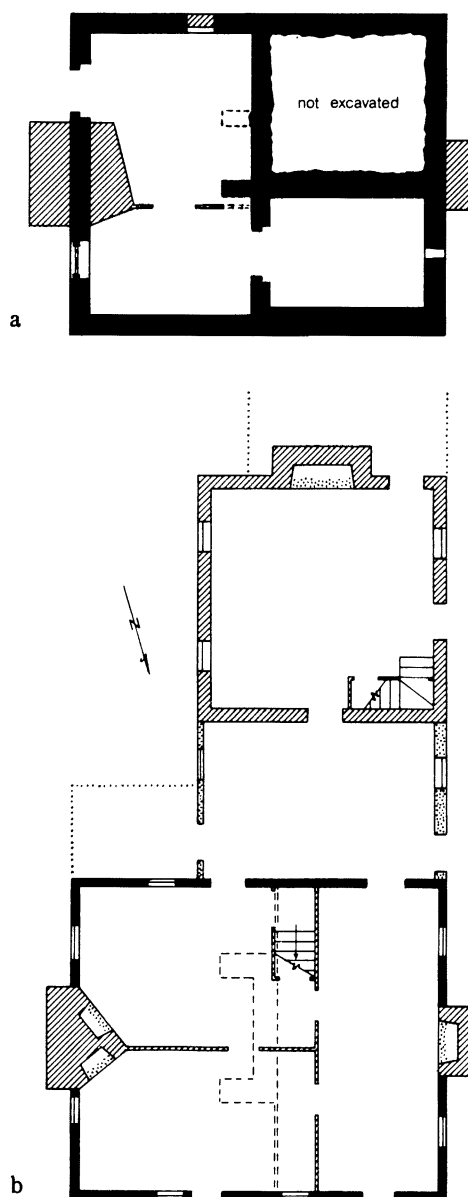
Abraham Spitler House. Cellar and first-floor plans.
